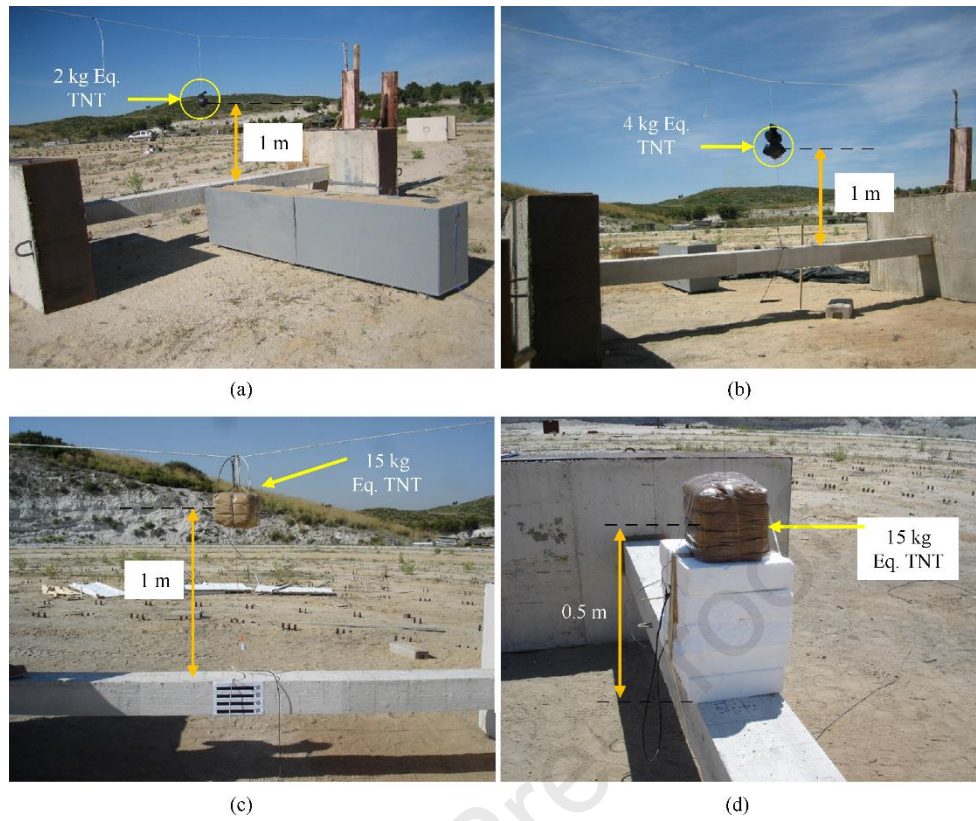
Images of the experimental field campaign: (a) Beam B1 (same settings as B2 and B3); (b) Beam B4; (c) Beam B5; (d) Beam B6.
